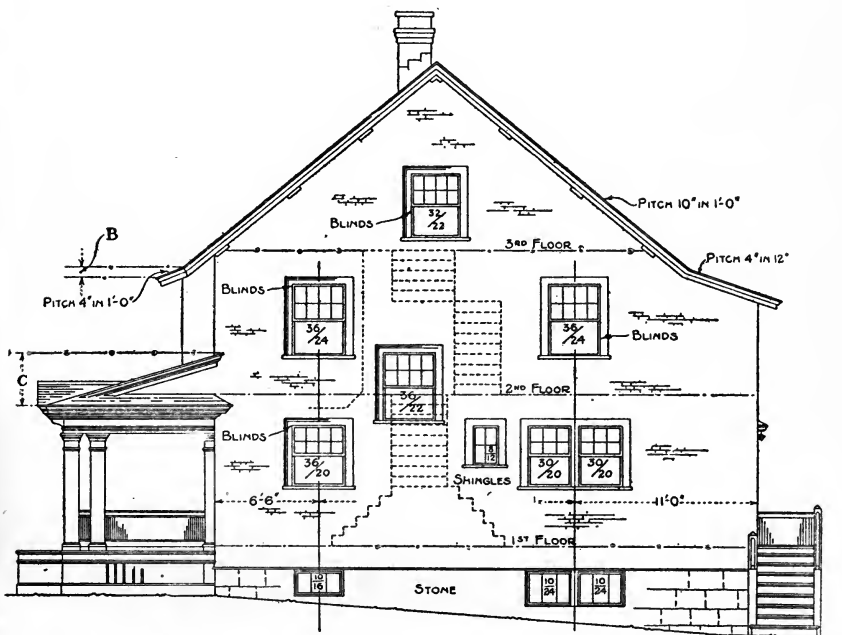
RIGHT SIDE OR NORTHWEST ELEVATION—SCALE  $\frac{1}{12}$  IN. TO THE FOOT
